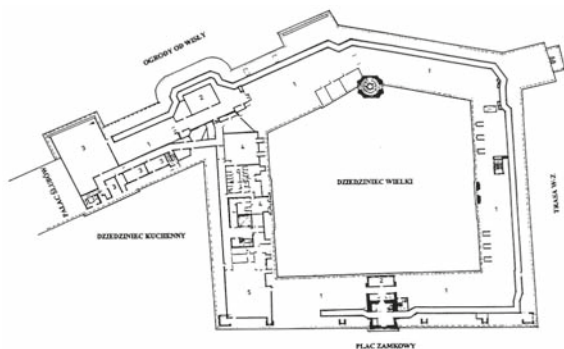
Warszawa – the Royal Castle. Plan of the 1st floor. Made by Author
